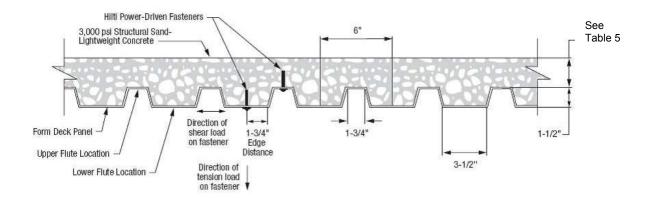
HILTI FASTENER LOCATIONS IN 1¹/₂-INCH-DEEP COMPOSITE FLOOR DECK PANEL
